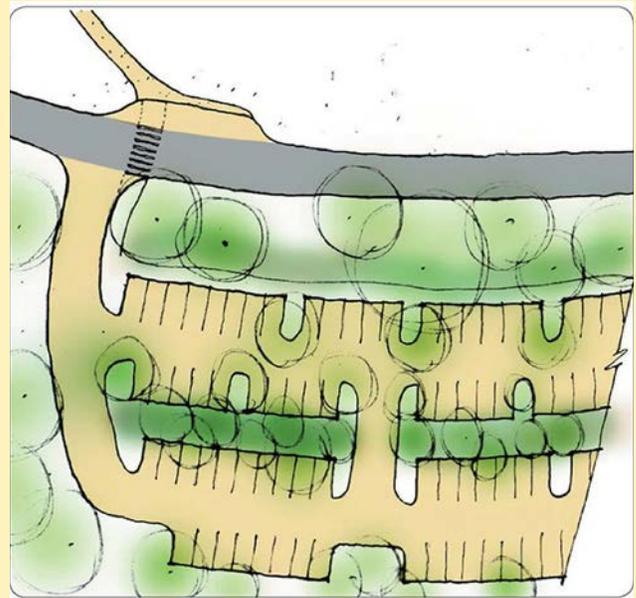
The use of green swales around a parking lot (Source: http://ucanr.edu/sites/Rod_Shippey_Facility/Green_Works/Permeable_Parking_Lot/).
